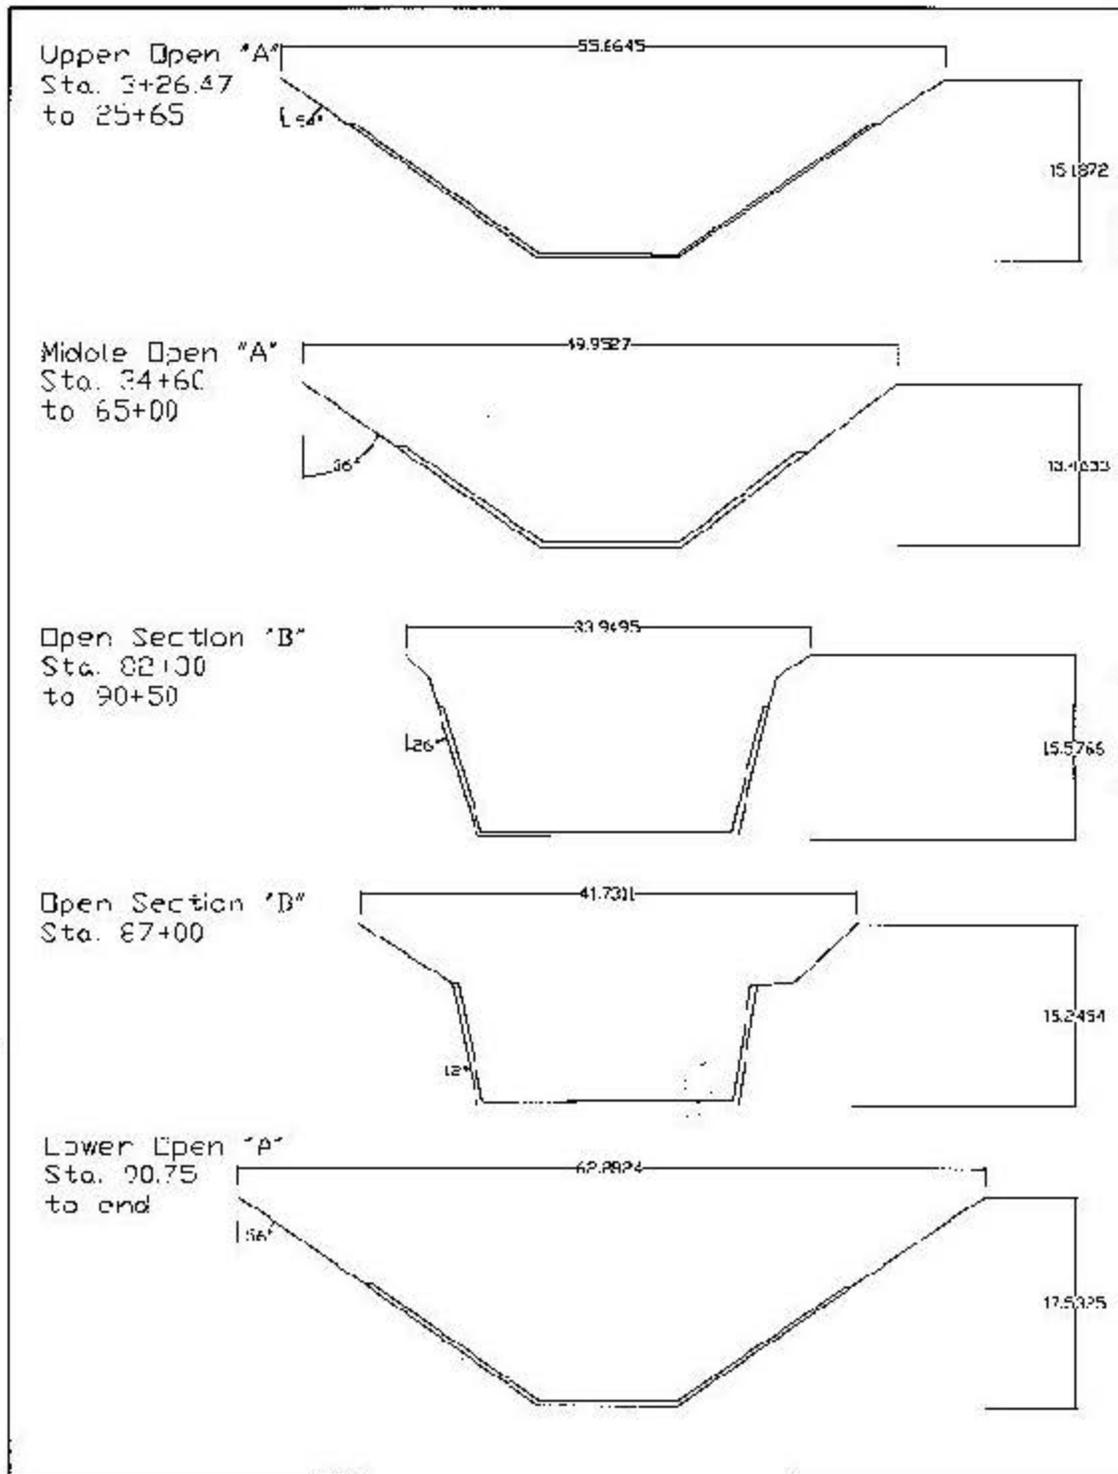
Representative Cross-sections of Open Channel Portions of the American Canal (Redrawn from original engineering drawings on file at IBWC).
